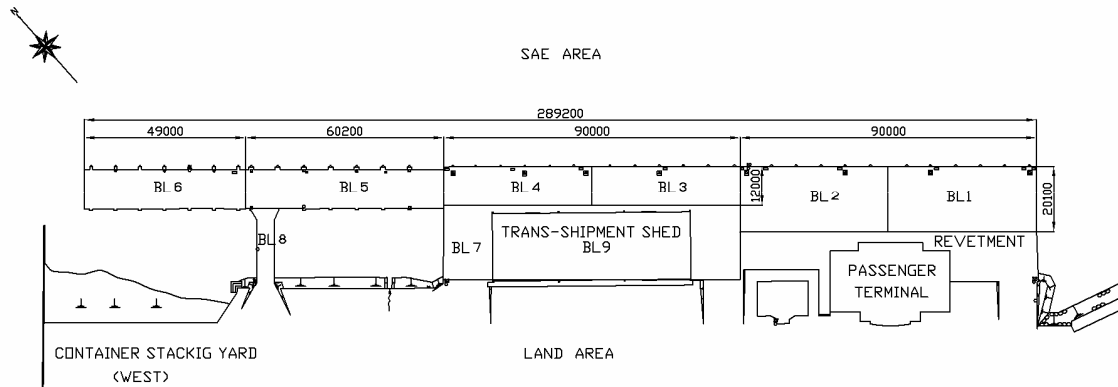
Illustrated Facility Layout Plan
